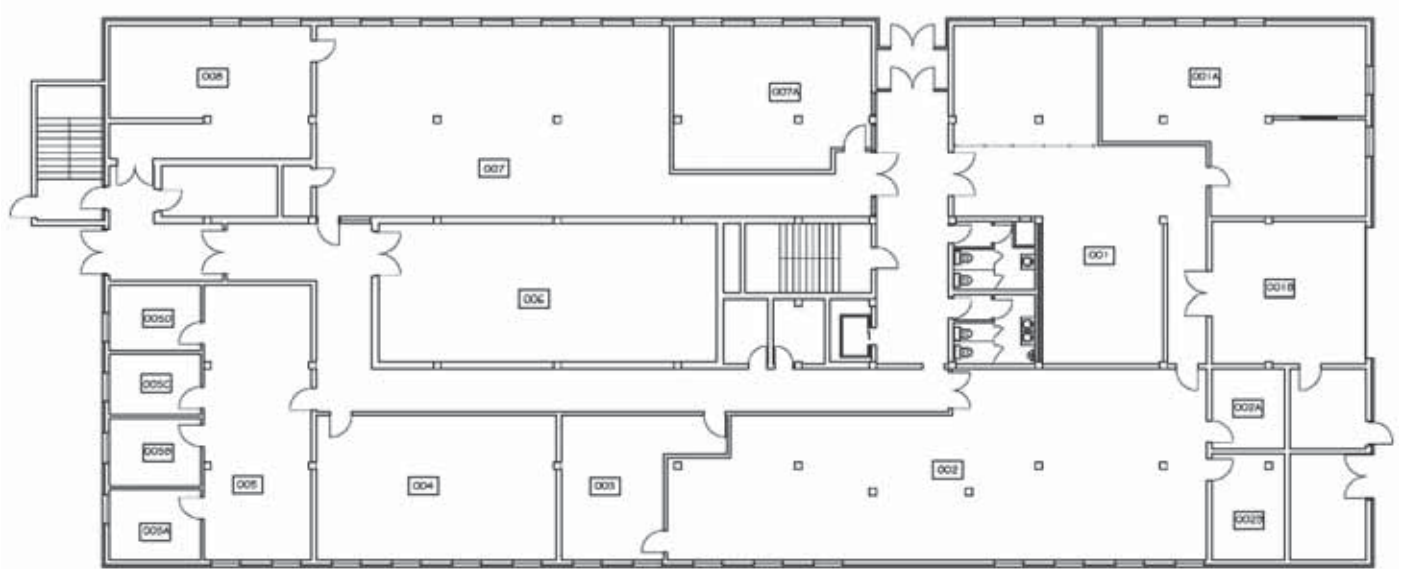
Basement floor plan from June 2008 Floor Plan drawings, Sheet A-1 (N.T.S.)
